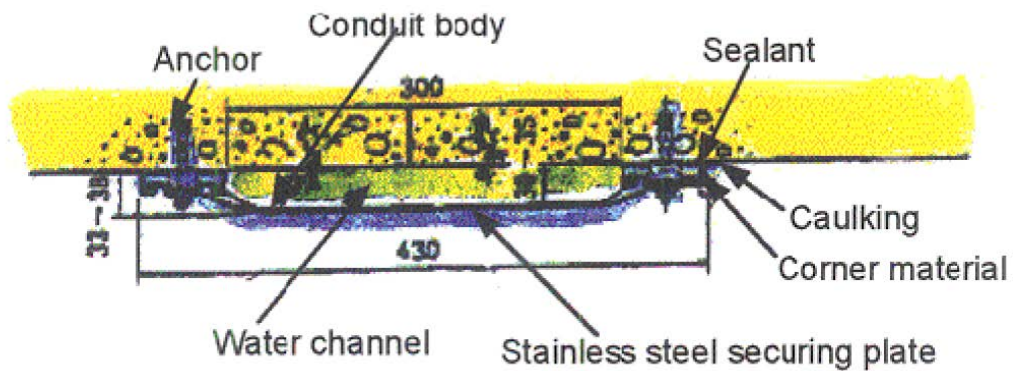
Conduit channel supported by steel securing plate and anchored to concrete roof for conveying water leakage (Russell, 2001)
